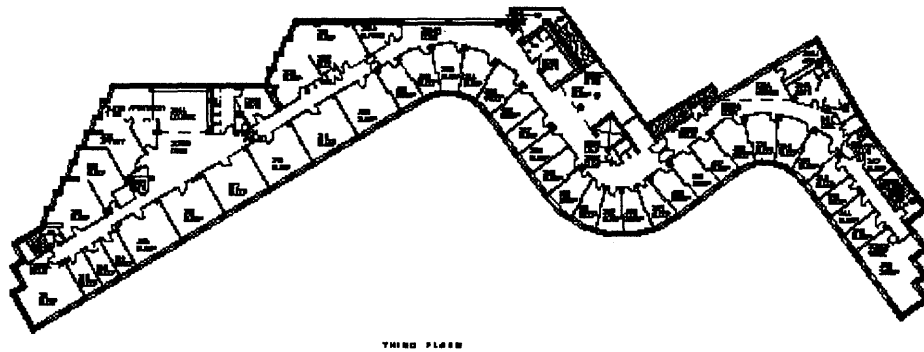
Floor Plan for Baker House Dorm (Third Floor)
